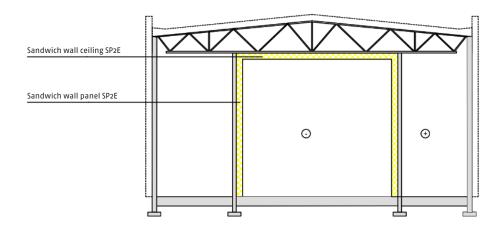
1.2 Ceiling supported from the trusses. Walls can be installed vertically, without frame.
